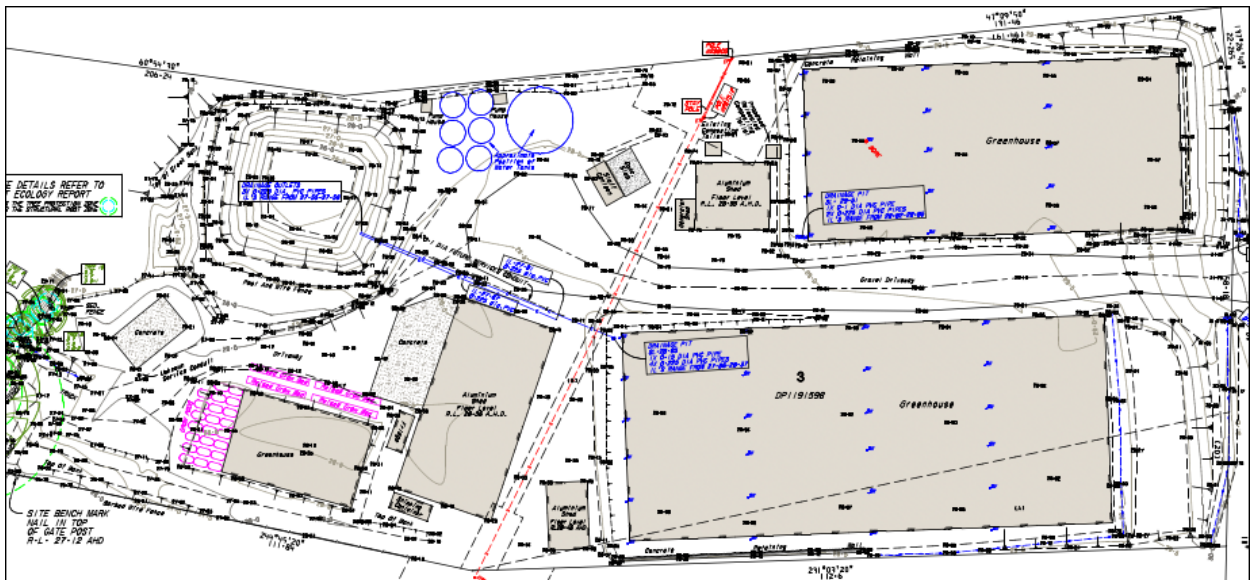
Existing site layout for approval including new garden beds (shown in pink)
